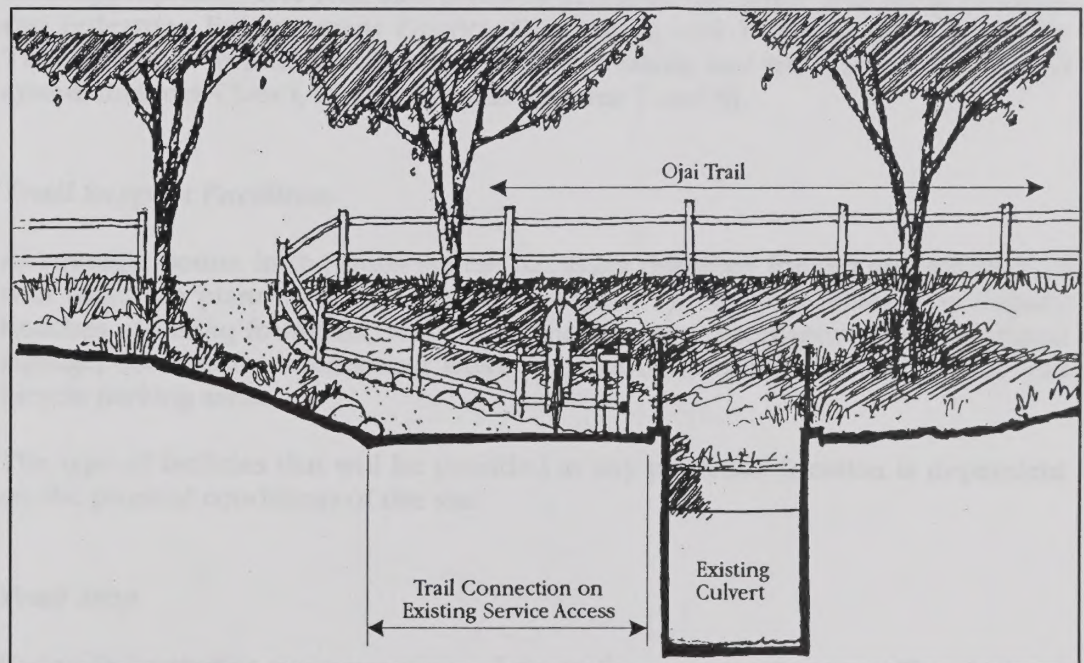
Lateral Trail Access from Ojai Avenue at Existing Culvert Parallel to Canada Street
